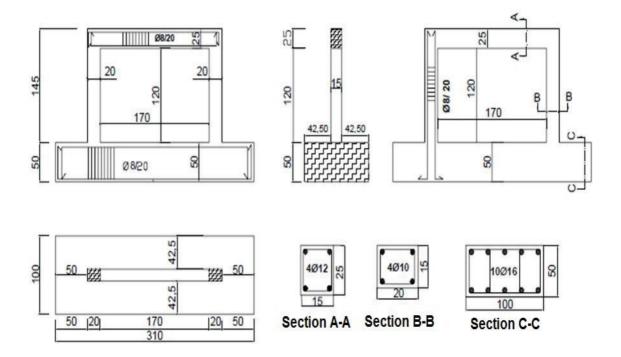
Dimensions of specimens and reinforcement details in cm (according to TS 500, 2000).
